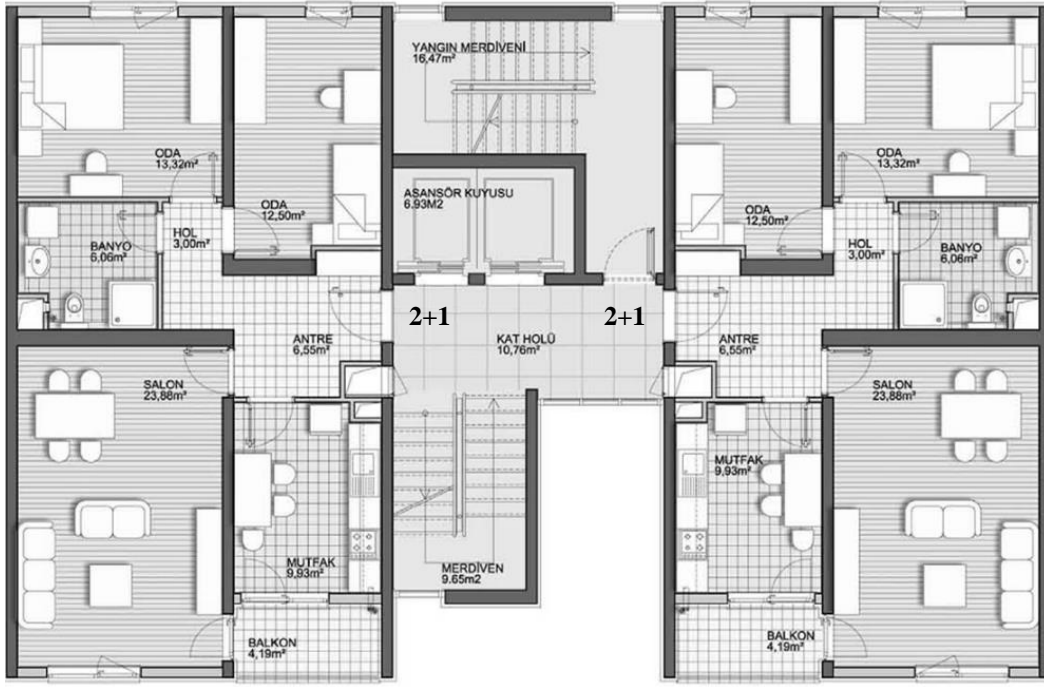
B1 Block Floor Plan 2+1 Apartments
